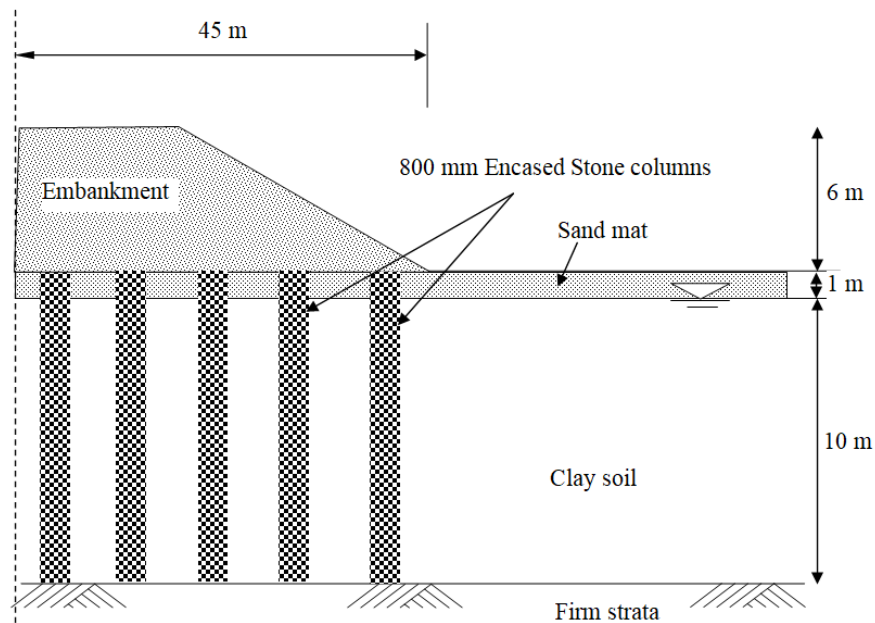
Cross-section of GESC supported embankment (Based on Yoo and Kim 2009)
